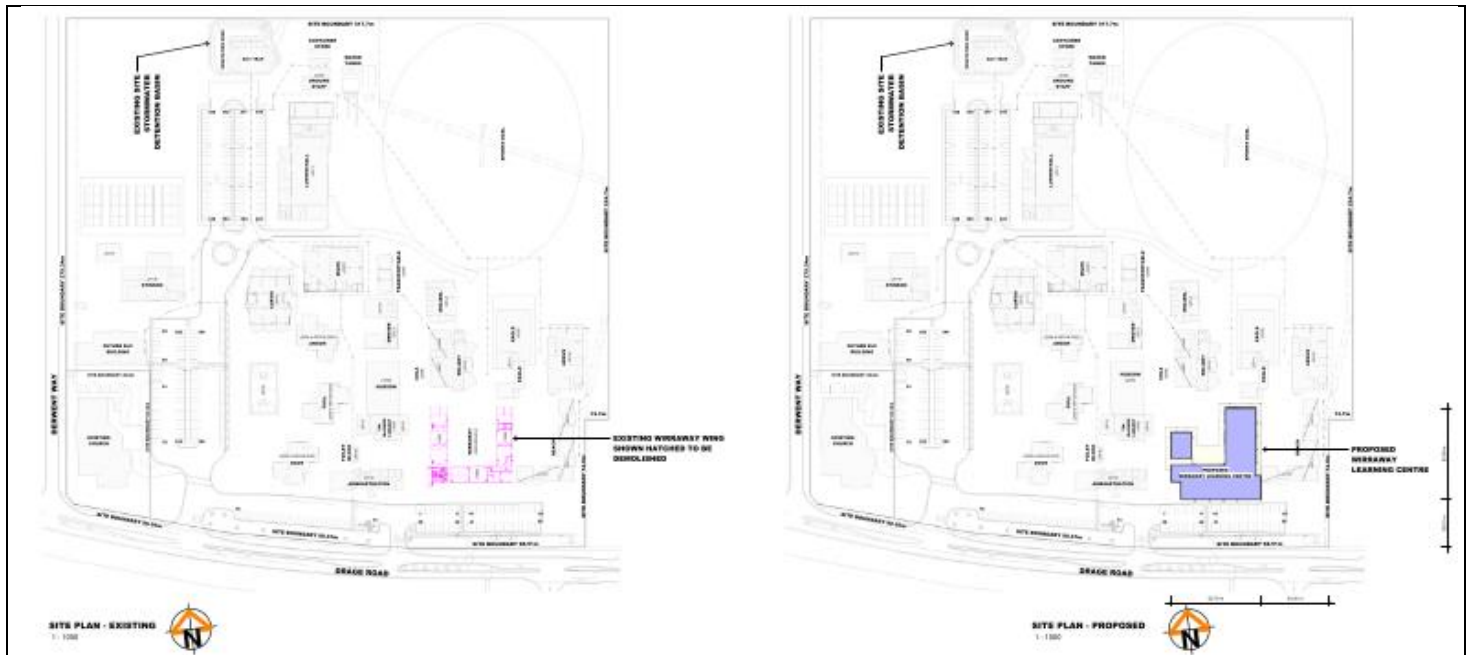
Proposed demolition and development site plan (Source: Decision plans)
